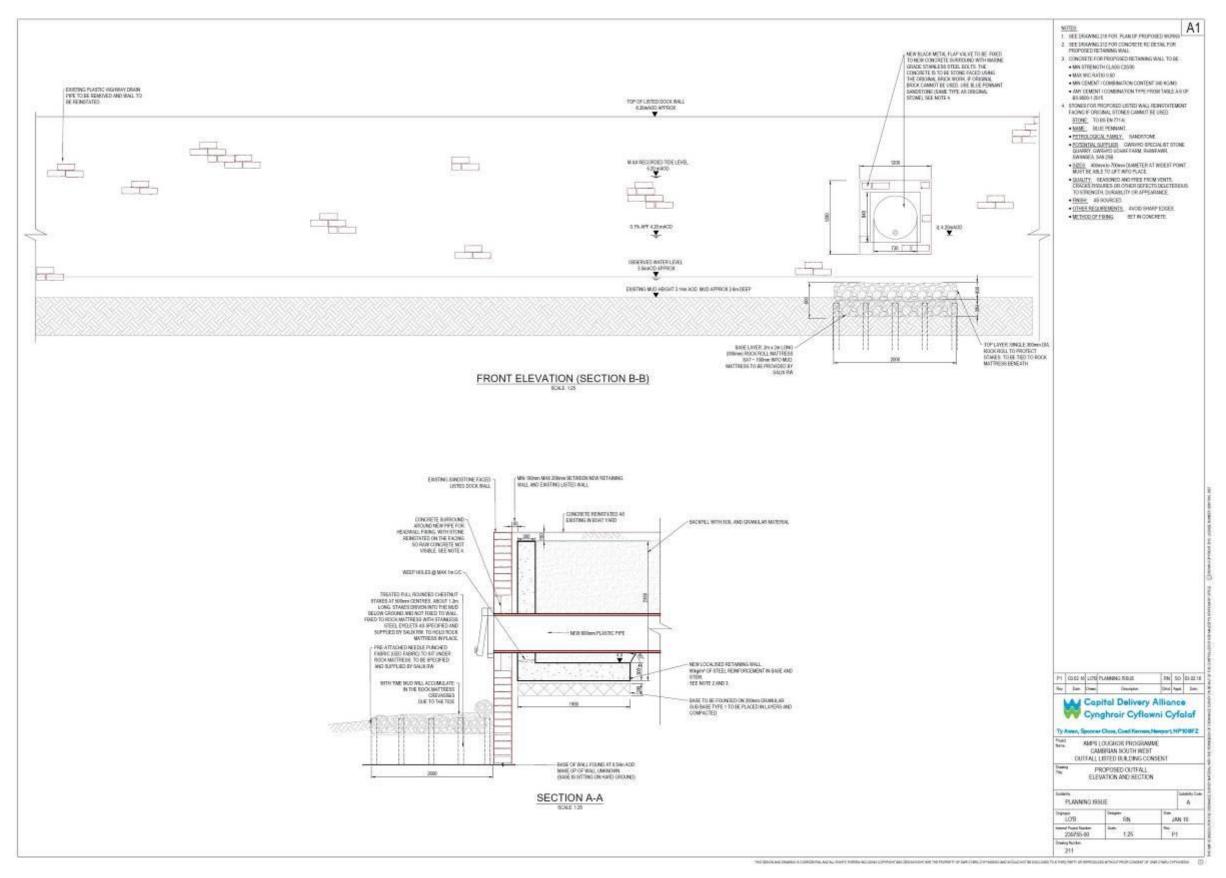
Elevation of East Quay Wall (top) and Section through Proposed Works (bottom) (Plan supplied by Morgan Sindall)
